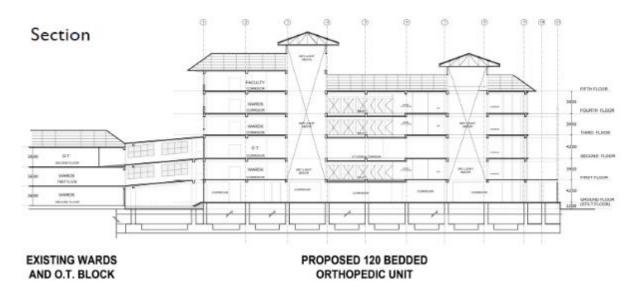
Section of Proposed 120 Bedded Orthopaedic Unit
